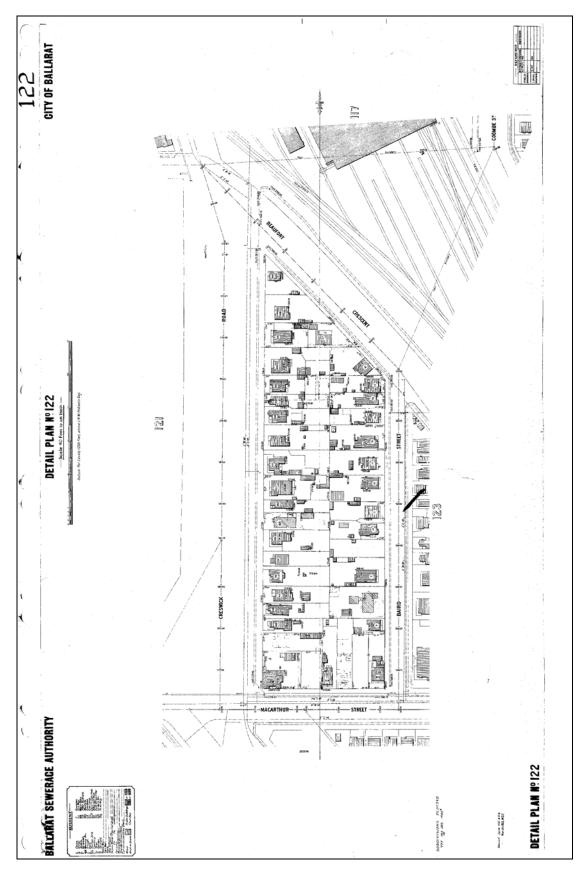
Ballarat Sewerage Authority Plan, 1933. Source: Planning Department, City of Ballarat.
